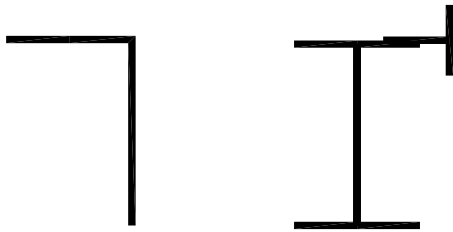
Lateral bracing detail resulting in twist about the shear center.
